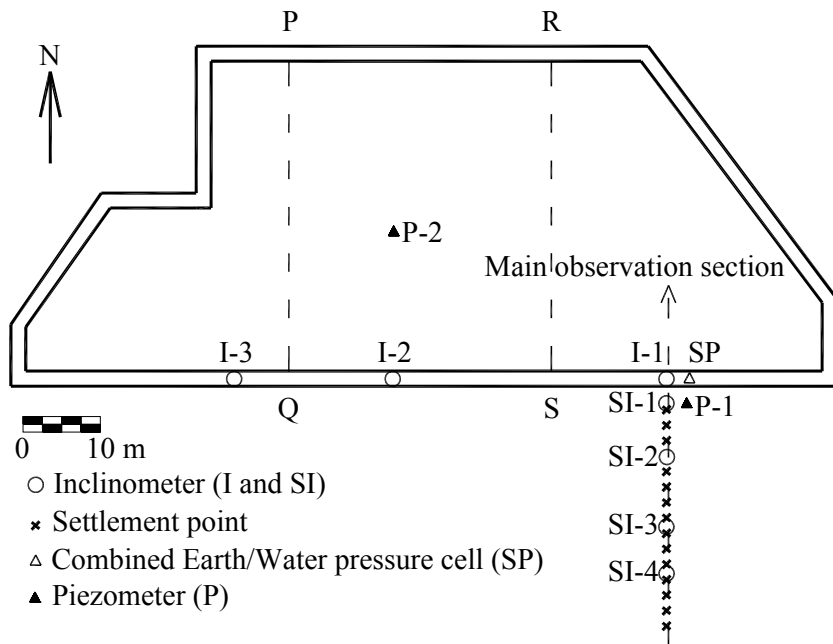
Plan view and instrument locations in TNEC excavation, modified after Ou et al. (1998)
